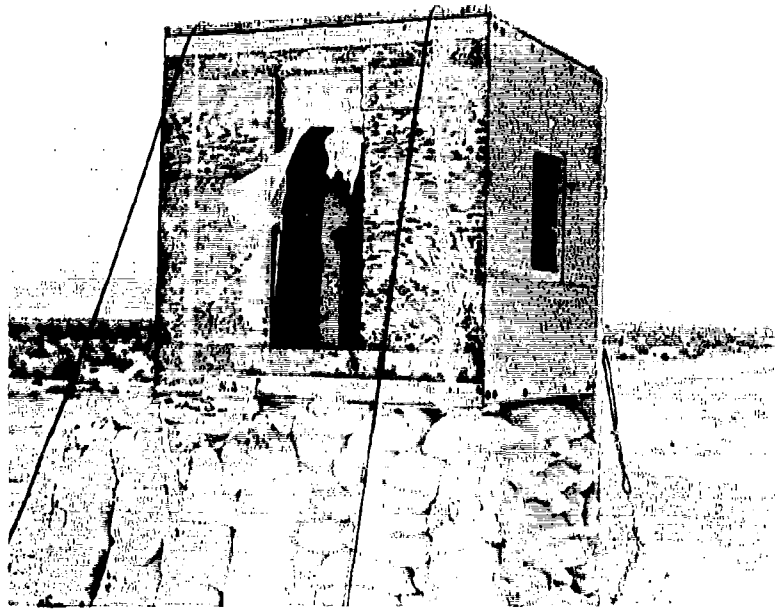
Room at 10,000-ft After Shot 3. Front wall singed. Sheetting covering sandbags burned away.
